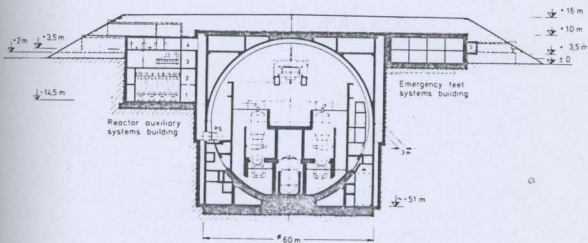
UNDERGROUNDED CAVITIES (SHOWING ROCK BOLTING) [75]
